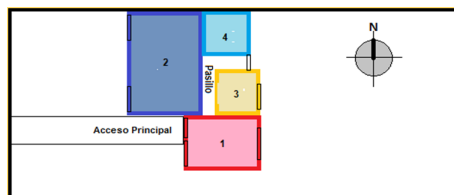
Base Prototype Schematic Floor Plan. References: 1- Living room, 2- Children's bedrooms, 3- Kitchen, 4- Bathroom.
